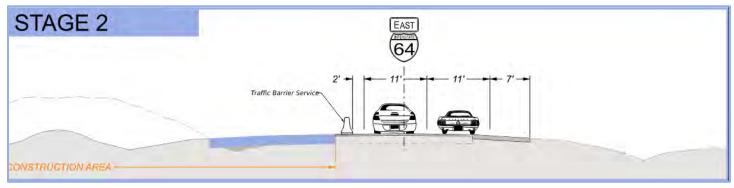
TMP Typical Sections, Stage 2
